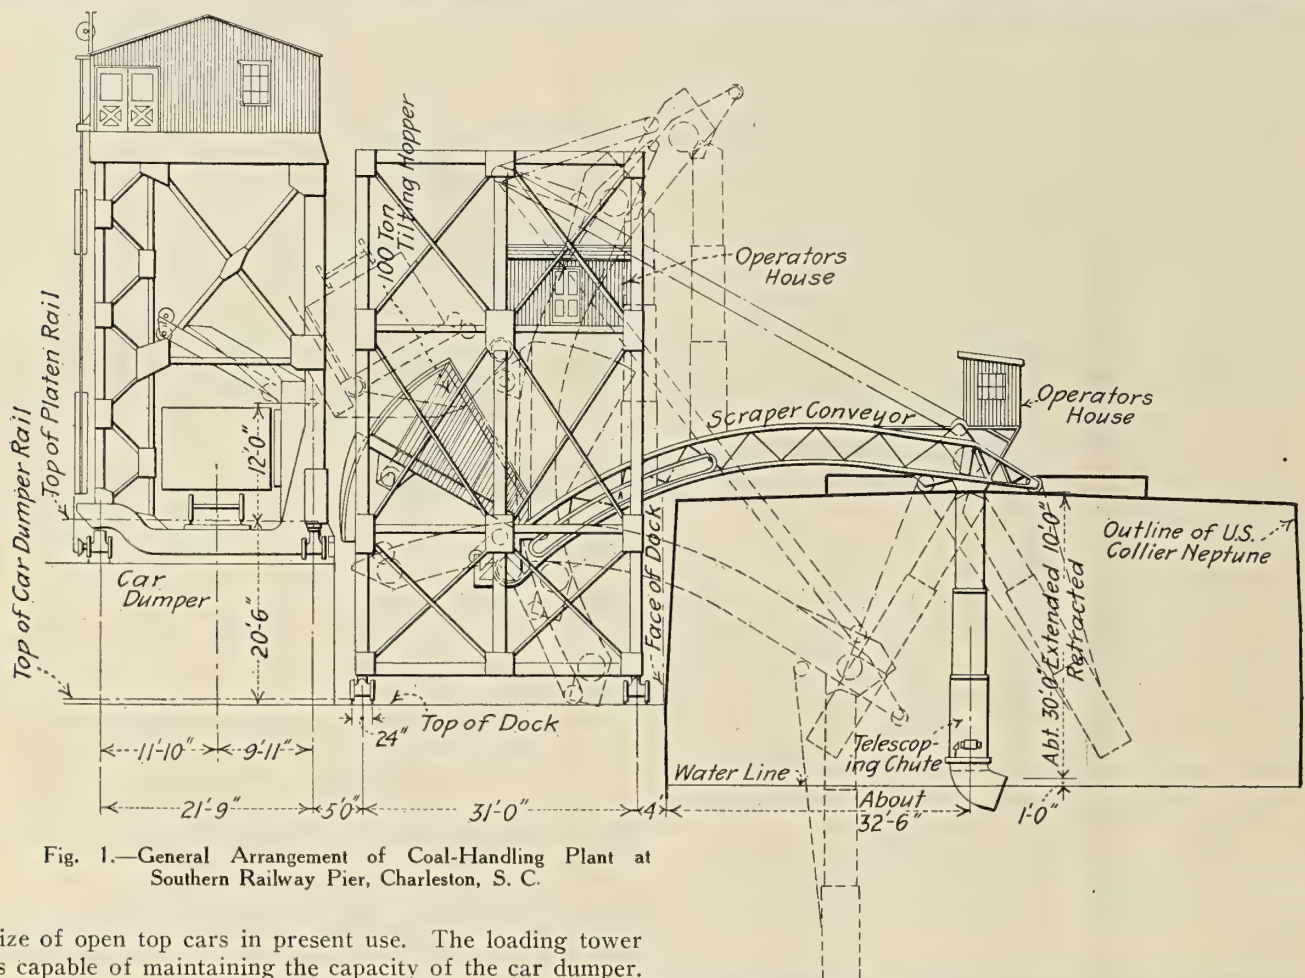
General Arrangement of Coal-Handling Plant at Southern Railway Pier, Charleston, S. C.
